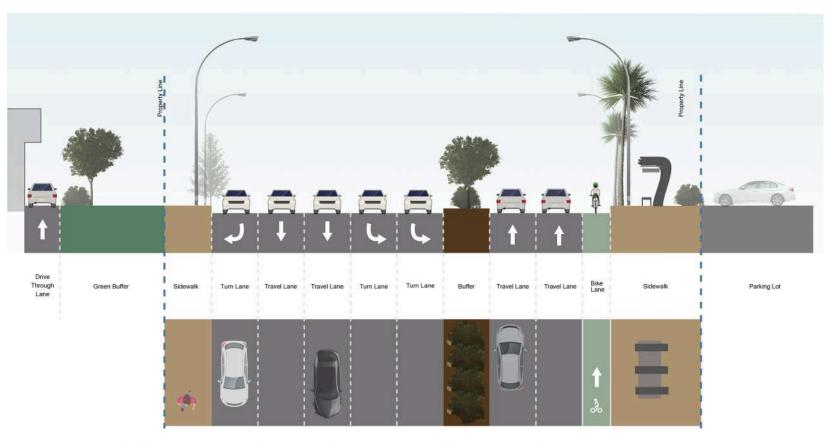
Existing Street Section - E. Kings Canyon Rd. @ S. Peach Ave.
